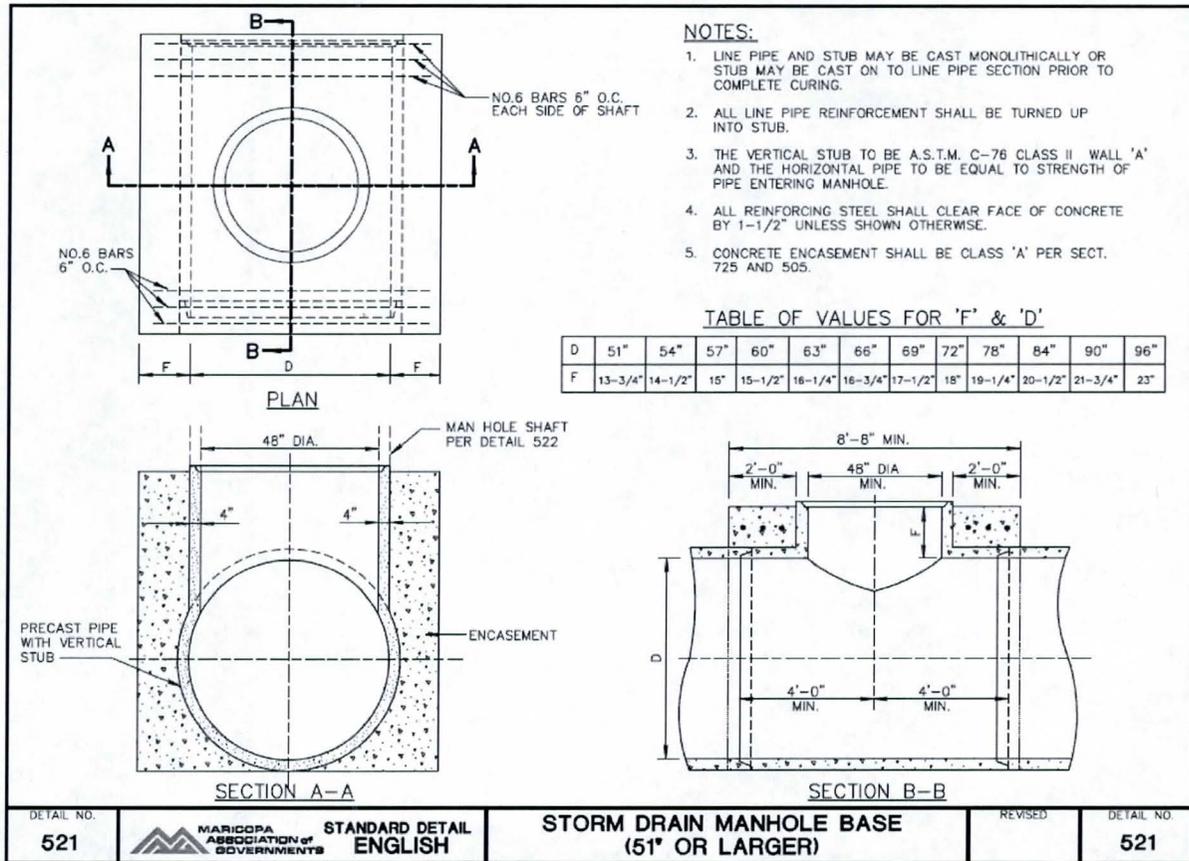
Manhole base for pipes 51" or larger (MAG Standard Detail 521)
